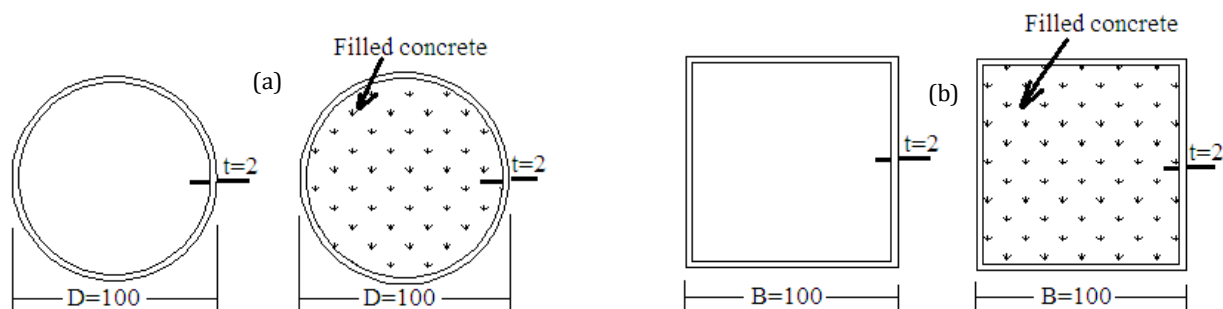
Cross section details for hollow steel tube and concrete filled steel tube columns:
